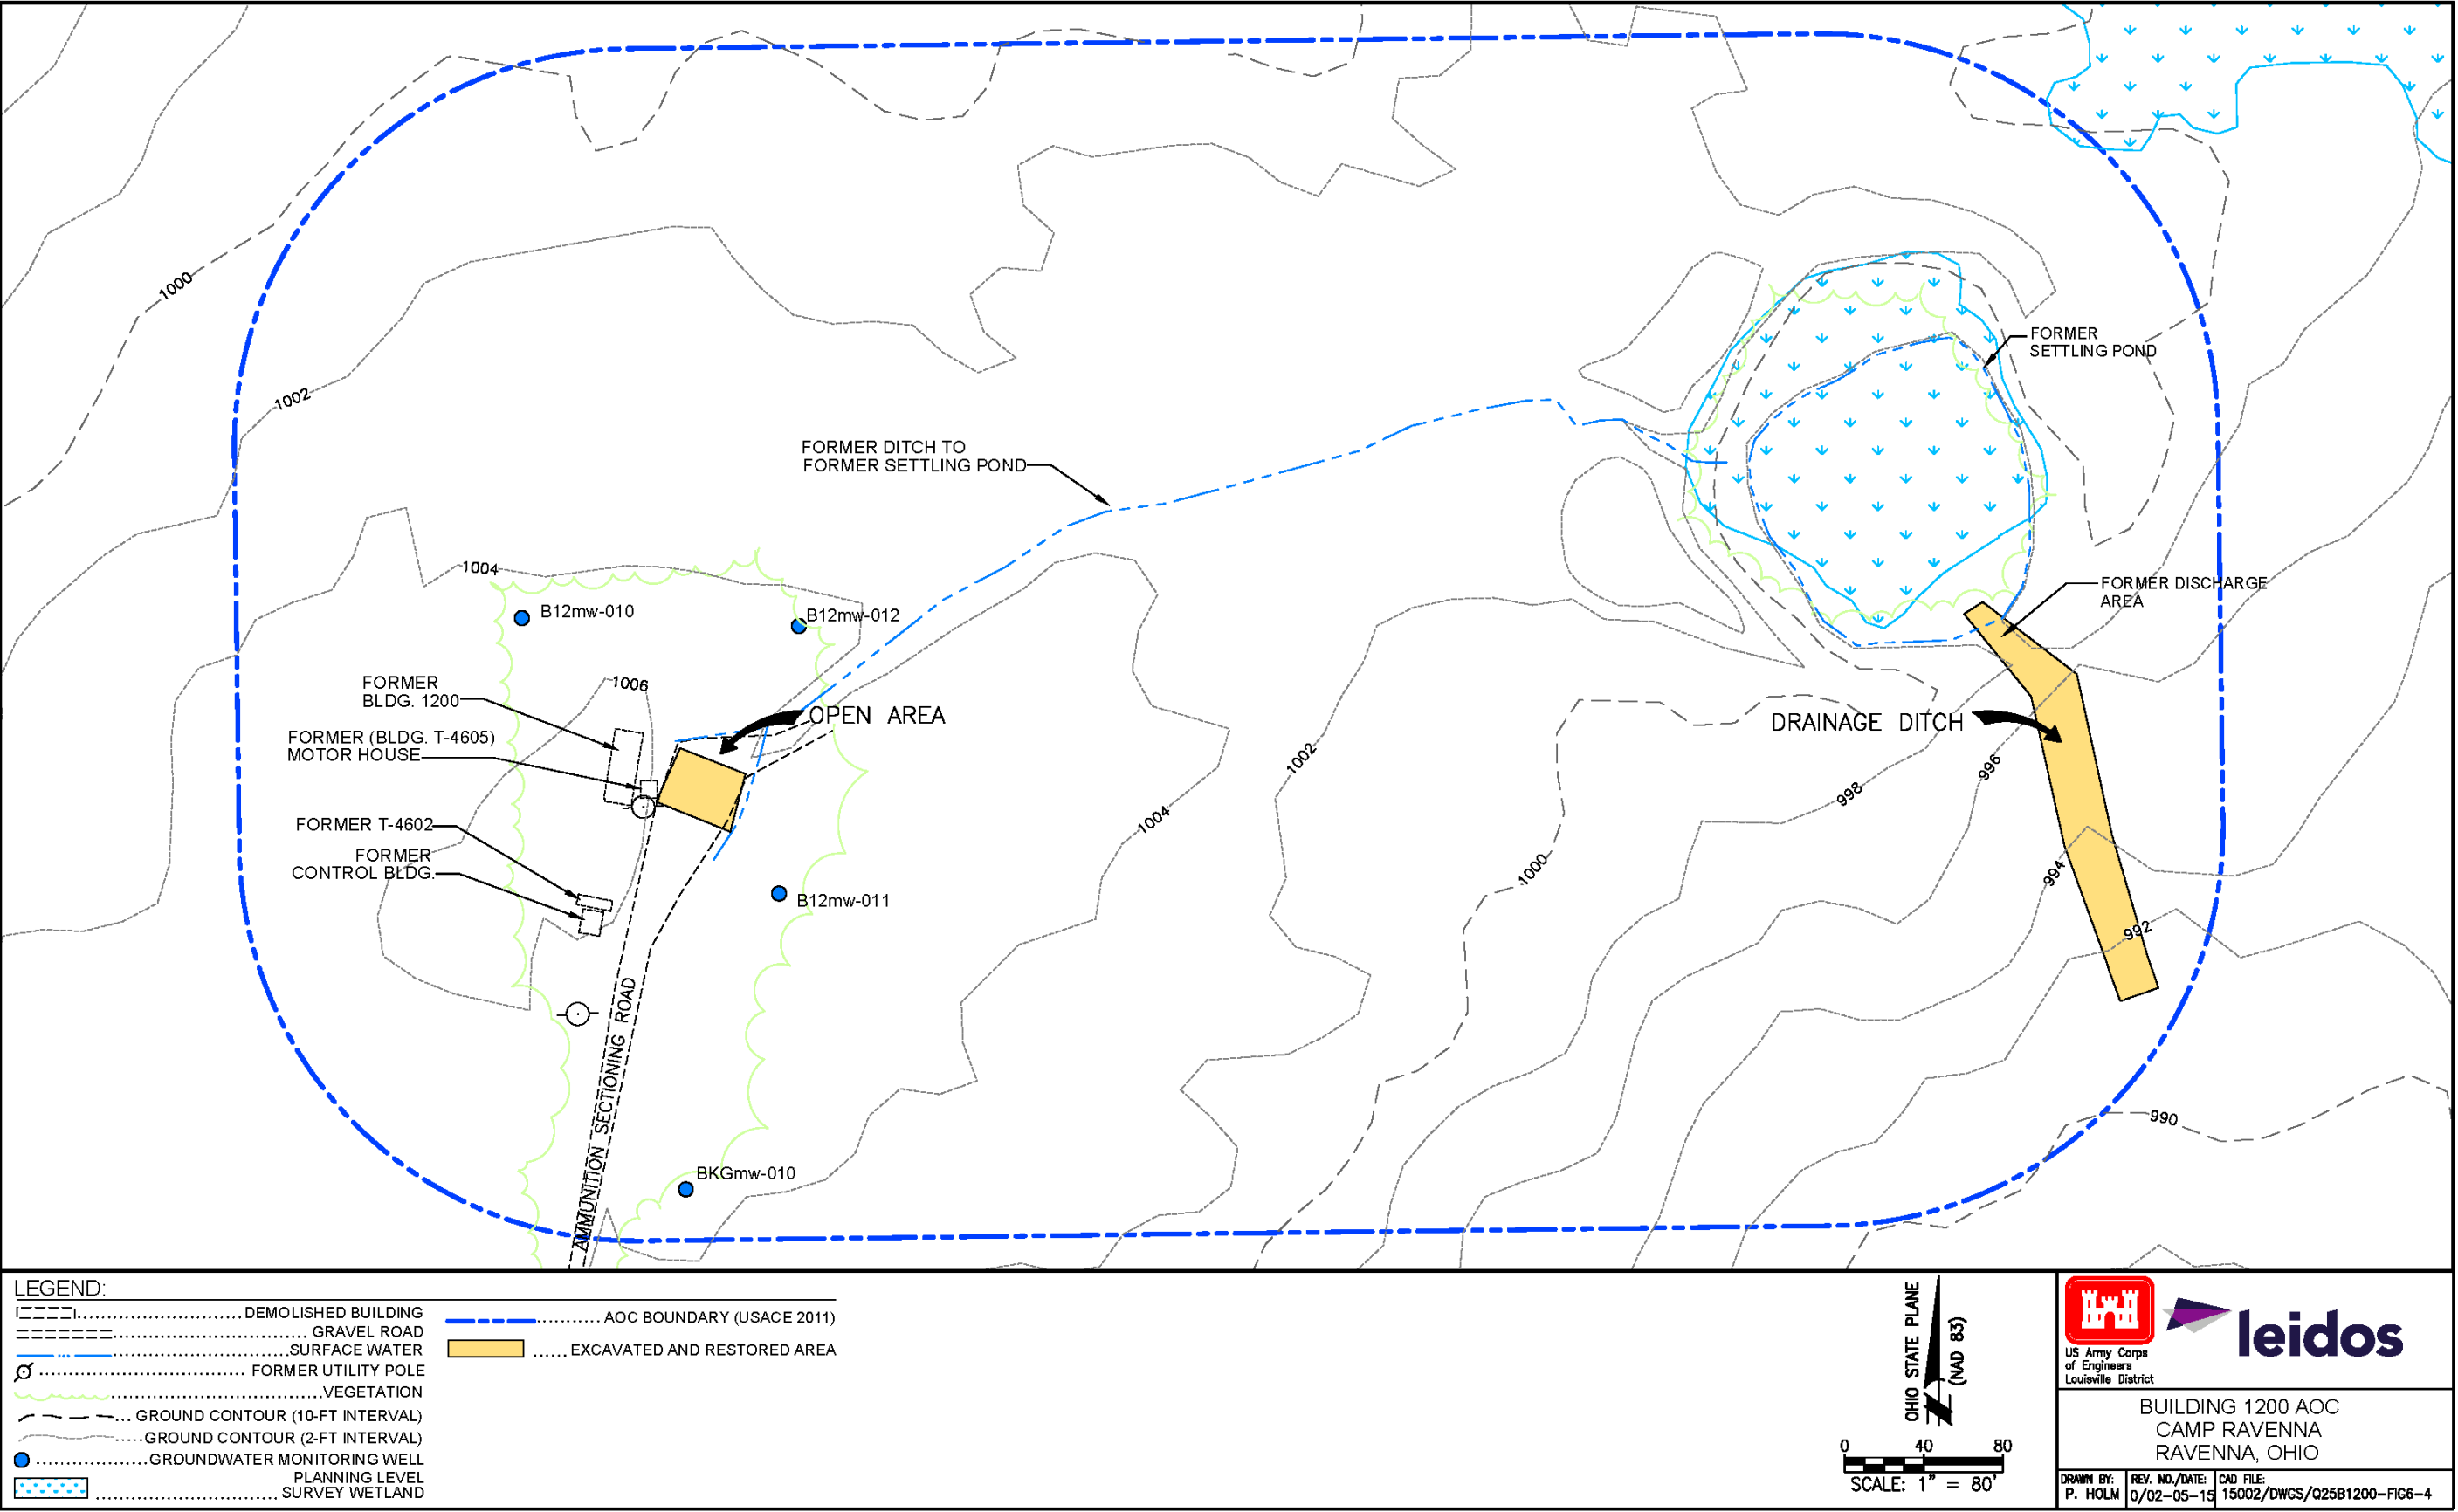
Excavation Area, Drainage Ditch (Final Surveyed Extent)
